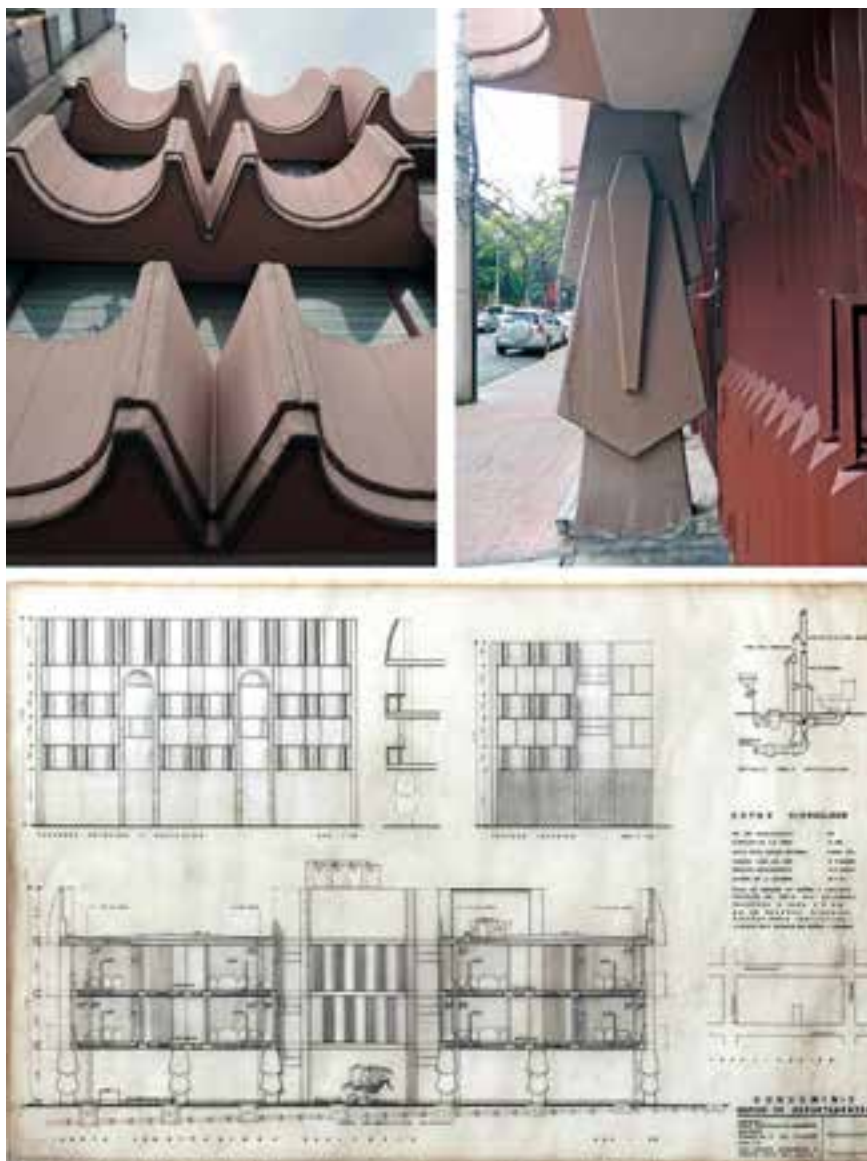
Photo, façade, and column detail, Minería 31, 2021; Architectural drawings, Minería 31, 1967.
